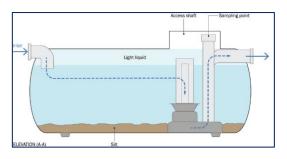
Typical Section Detail of Fuel Separator (CIRIA C753)
